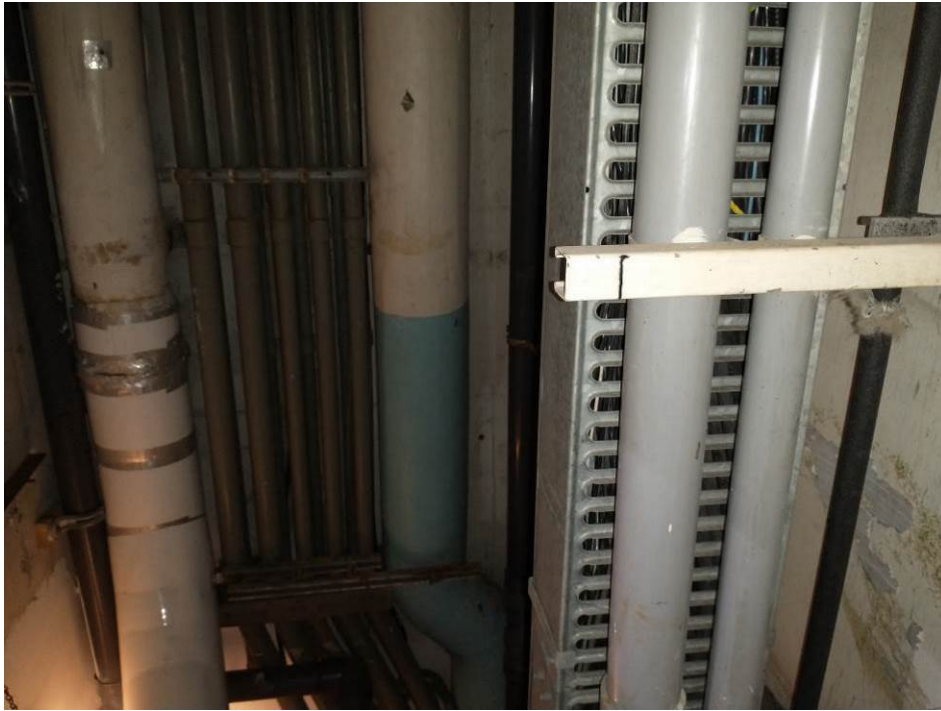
View of the asbestos-containing mechanical linear pipe insulation observed in the hallway on the 2<sup>nd</sup> floor of the Filter Building.
